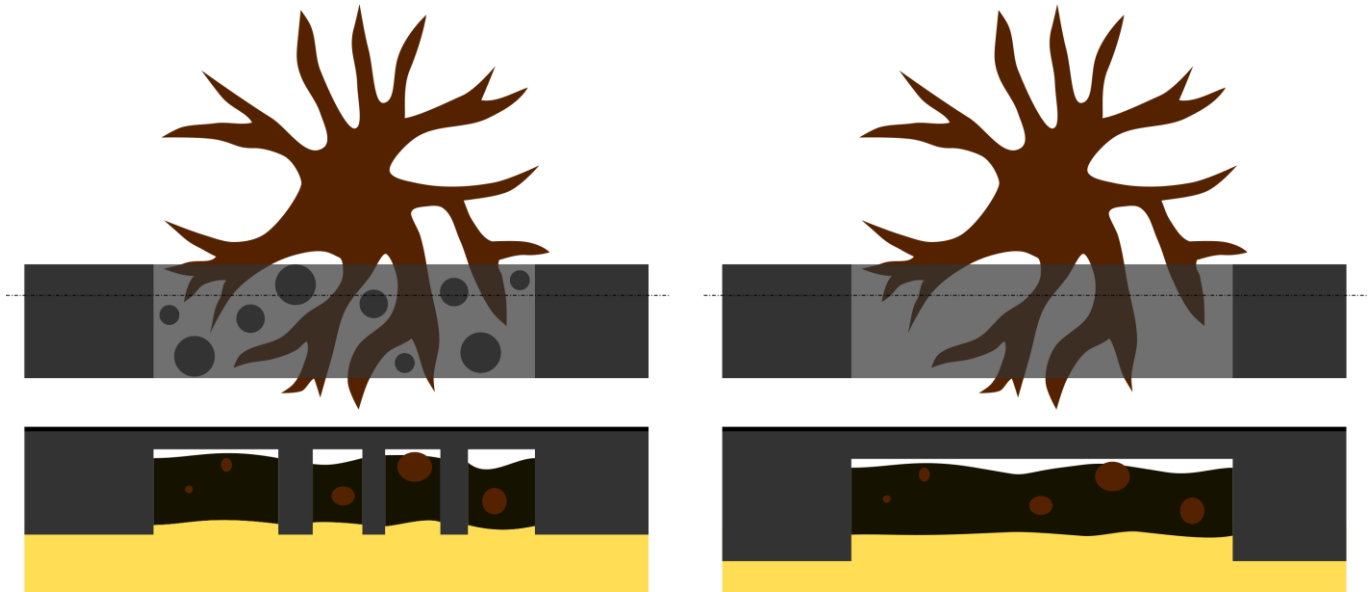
Ground plan (upper row) and longitudinal section (lower row) of a root bridge with spot and strip foundation (left column) resp. strip foundation only (right column)
